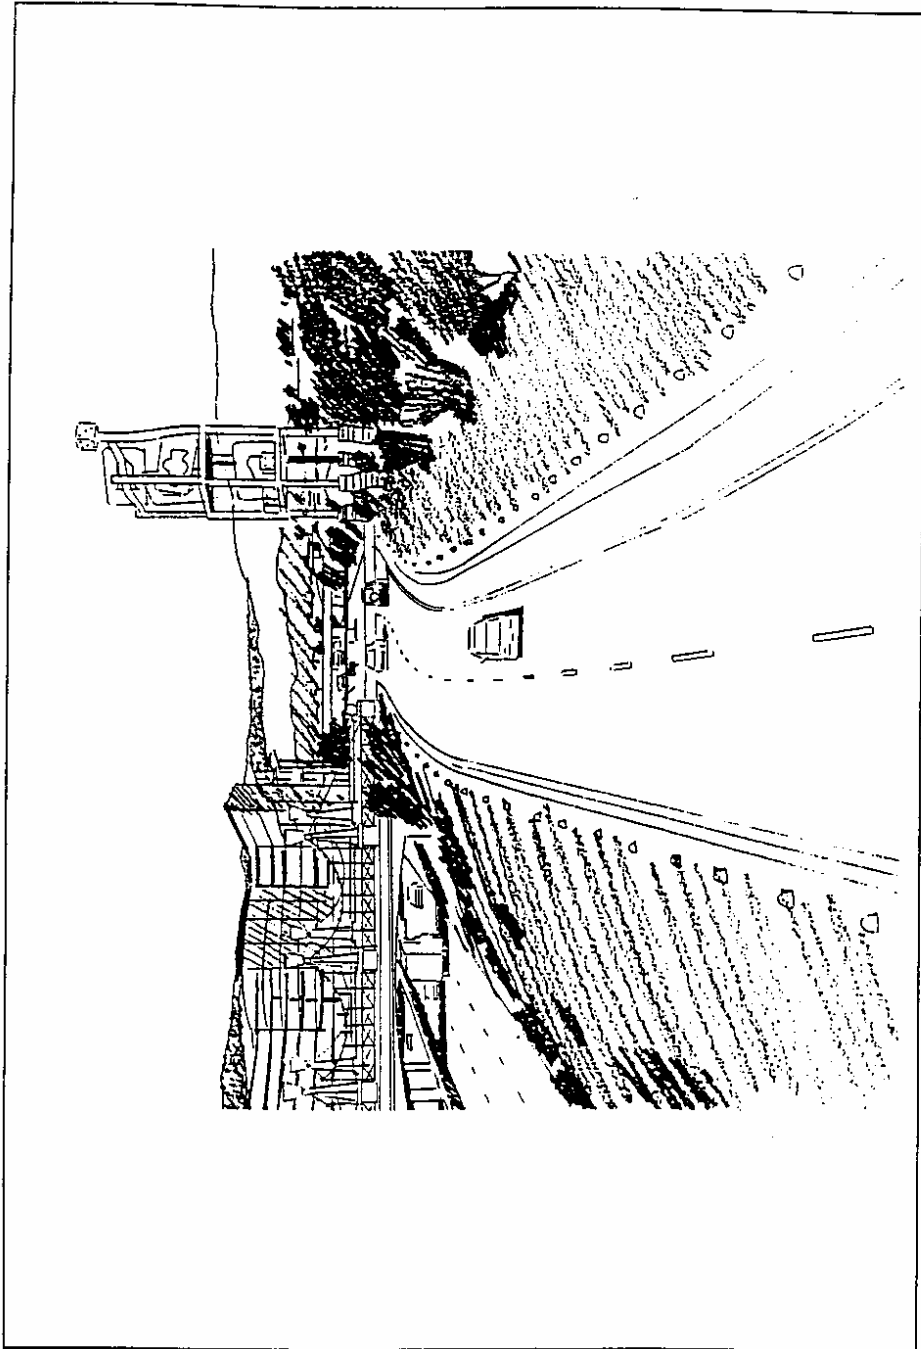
I-80 OFFRAMP HEADING EAST TO SIERRA STREET
